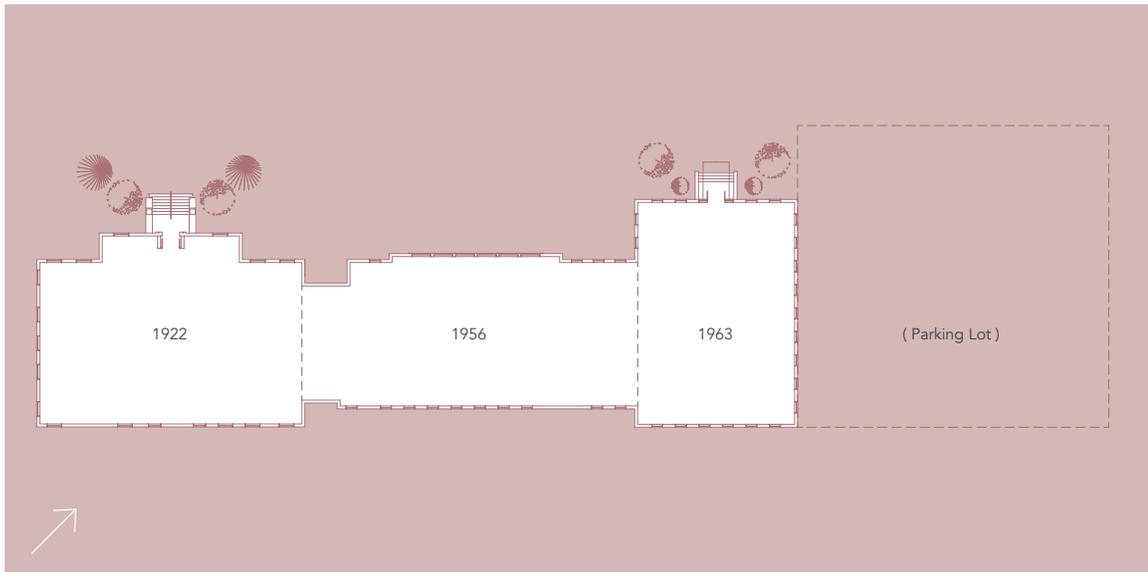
\_ 330 Gilmour Existing Plan Outline, Interior Unknown
